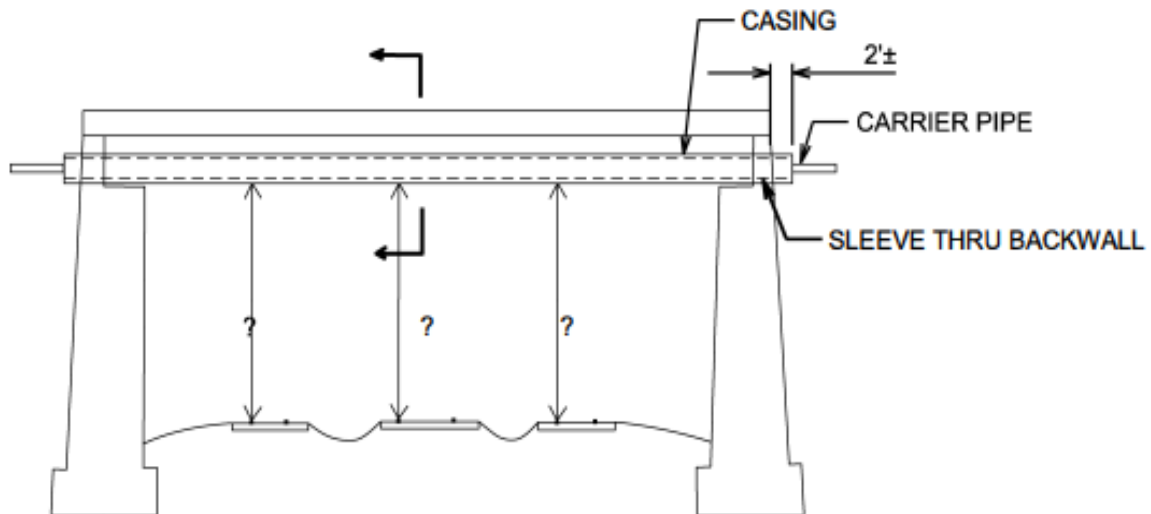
## Plate VI - Sample Pipe Plan and Section Under Railway Bridge
